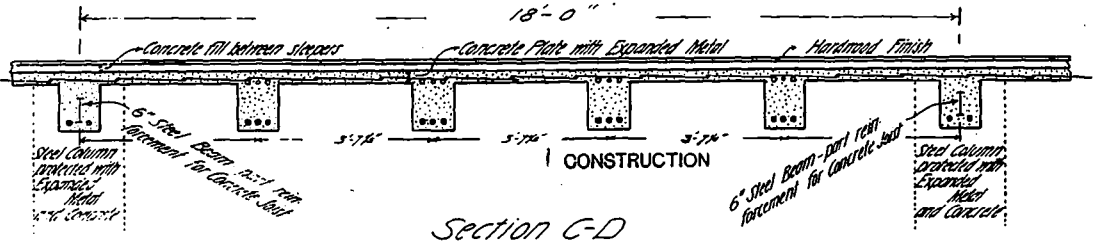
DIAGRAM OF CROSS SECTION OF TYPICAL BAY, OGILVIE BUILDING, TORONTO, GIVING SECTIONAL END VIEW OF EACH OF THE SIX CONCRETE JOIST BEAMS THAT DIVIDE EACH BAY INTO FIVE PANELS. THIS DIAGRAM ALSO SHOWS THE SMALL TIE BEAMS WHICH RUN IN OPPOSITE DIRECTION TO THE GIRDERS, AND TIE THE COLUMNS ONE TO THE OTHER, THUS MAKING A SECURE SKELETON FRAME TO SUPPORT THE CONCRETE FLOORS. THIS SECTION IS DESIGNATED AS C-D IN FIG. 16.
